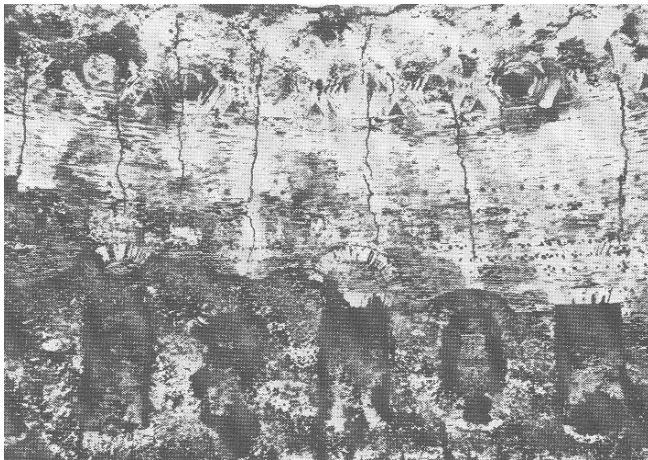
Radial cracks in the old dome masonry structure (UNDP, Vol. 6)
